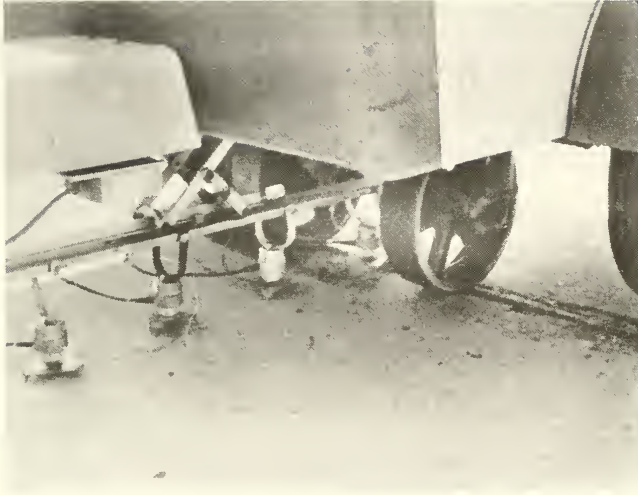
Measuring Pavement Deflection at a Joint Position
